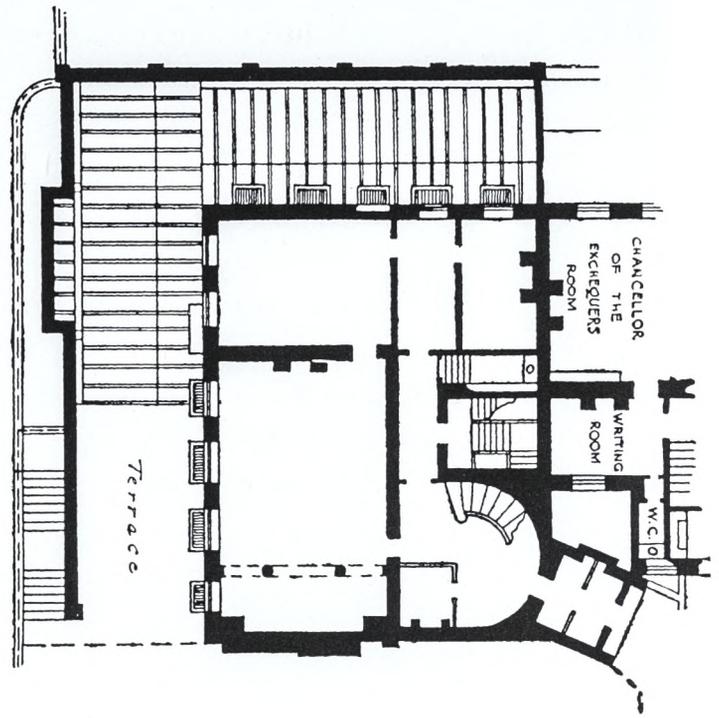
Plan of ground floor of 13 Downing Street circa 1879. *Survey of London*.
